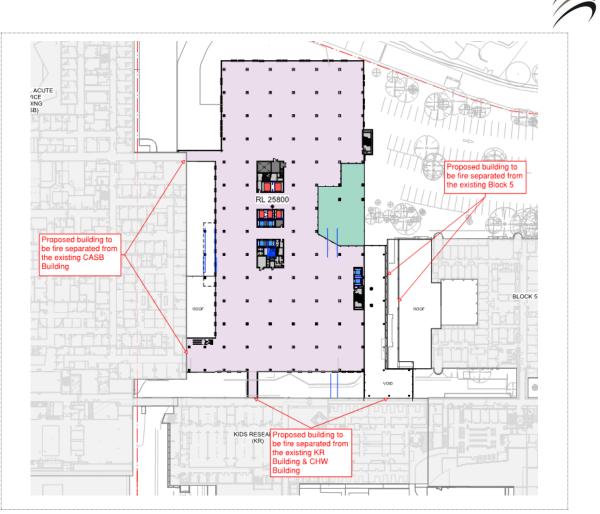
Required separation of PBS from existing adjoining Hospital Buildings on Levels 02 & 03
